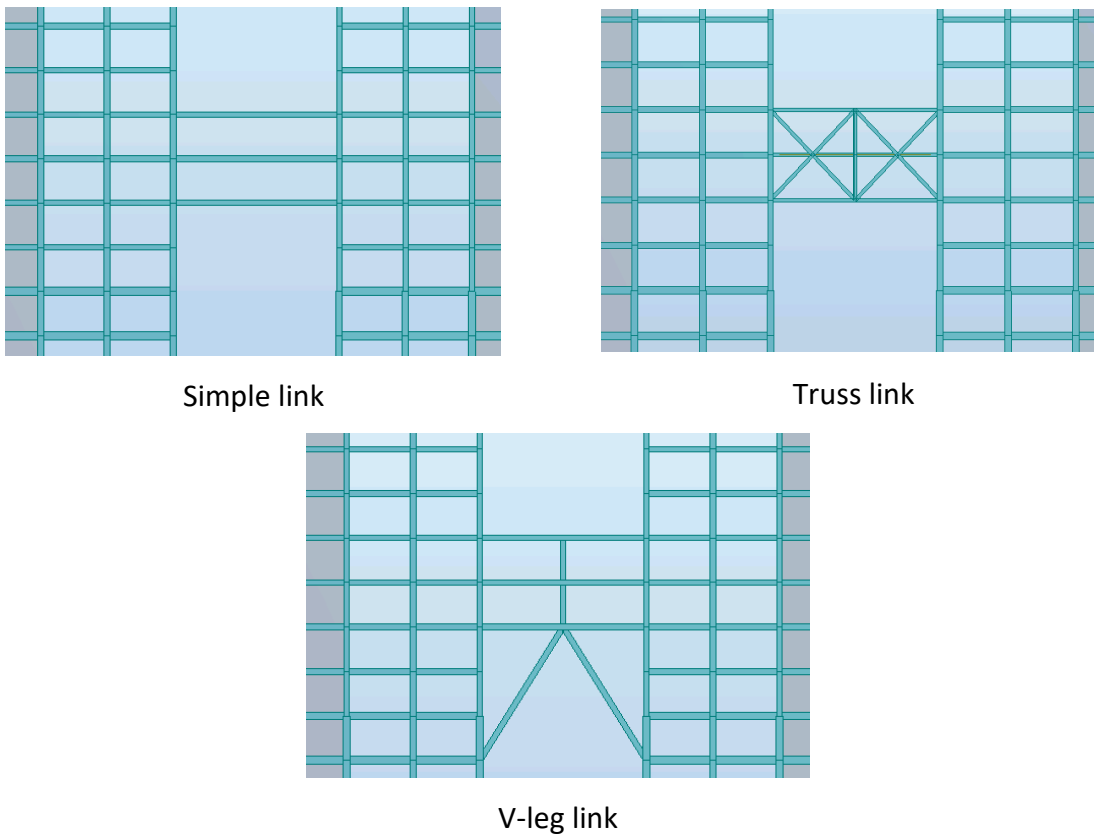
Different structural link types evaluated in the linked building system. All links have 120mm thick concrete floor plates. The truss link uses square 300mm wide by 10mm thick hollow sections for the horizontal and diagonal members, with a HEB300 profile as a vertical column, all from S355 steel. The V-leg link has 50x50cm² diagonal columns, supporting the vertical 40x40cm² central column.
